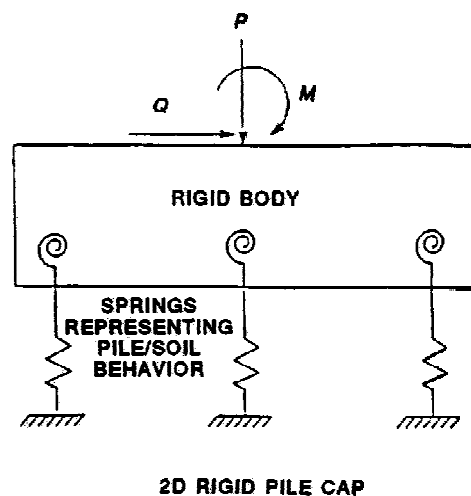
Rigid pile cap on a spring (pile) foundation
